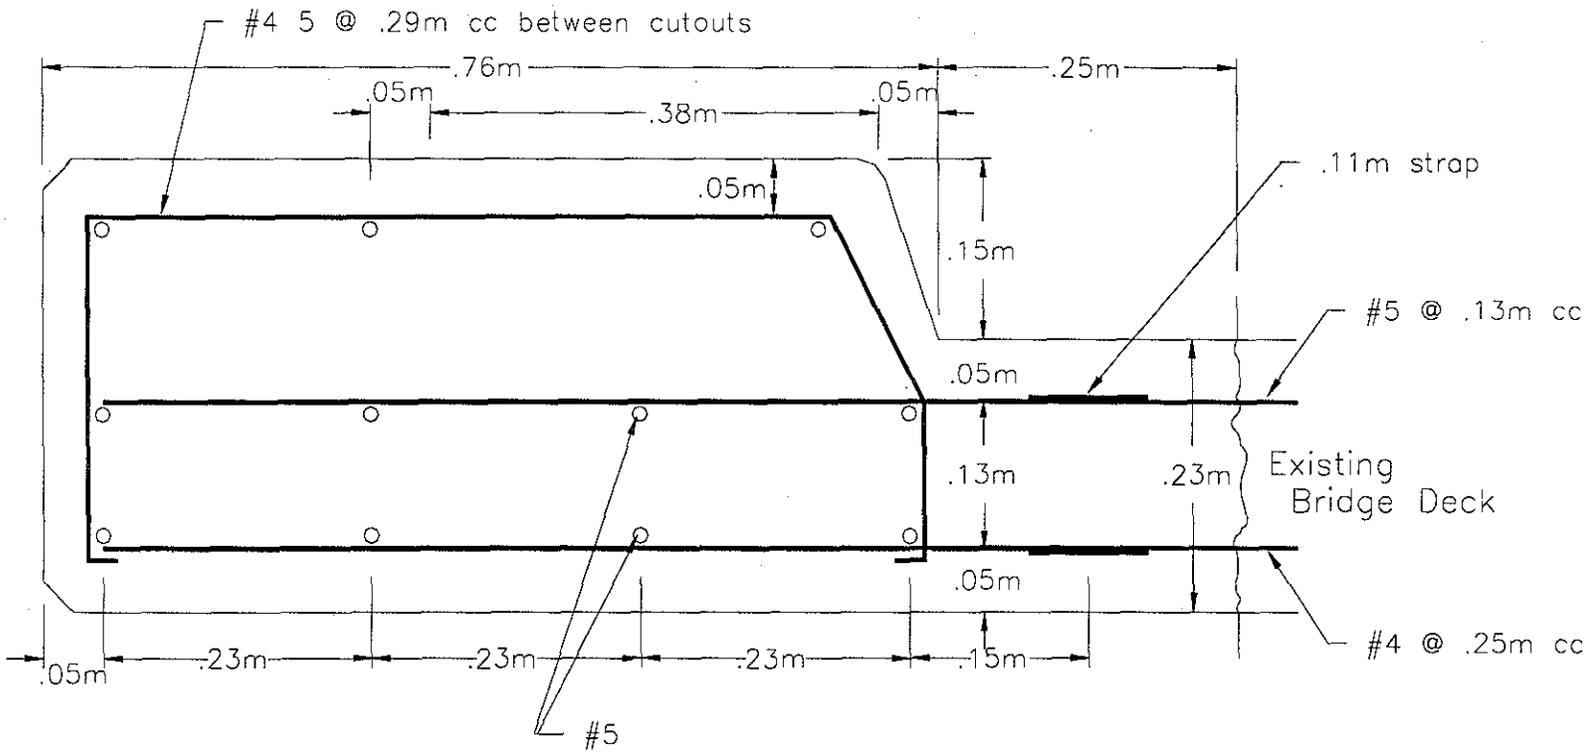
Steel reinforcement details for Washington, DC, historic bridge rail.
